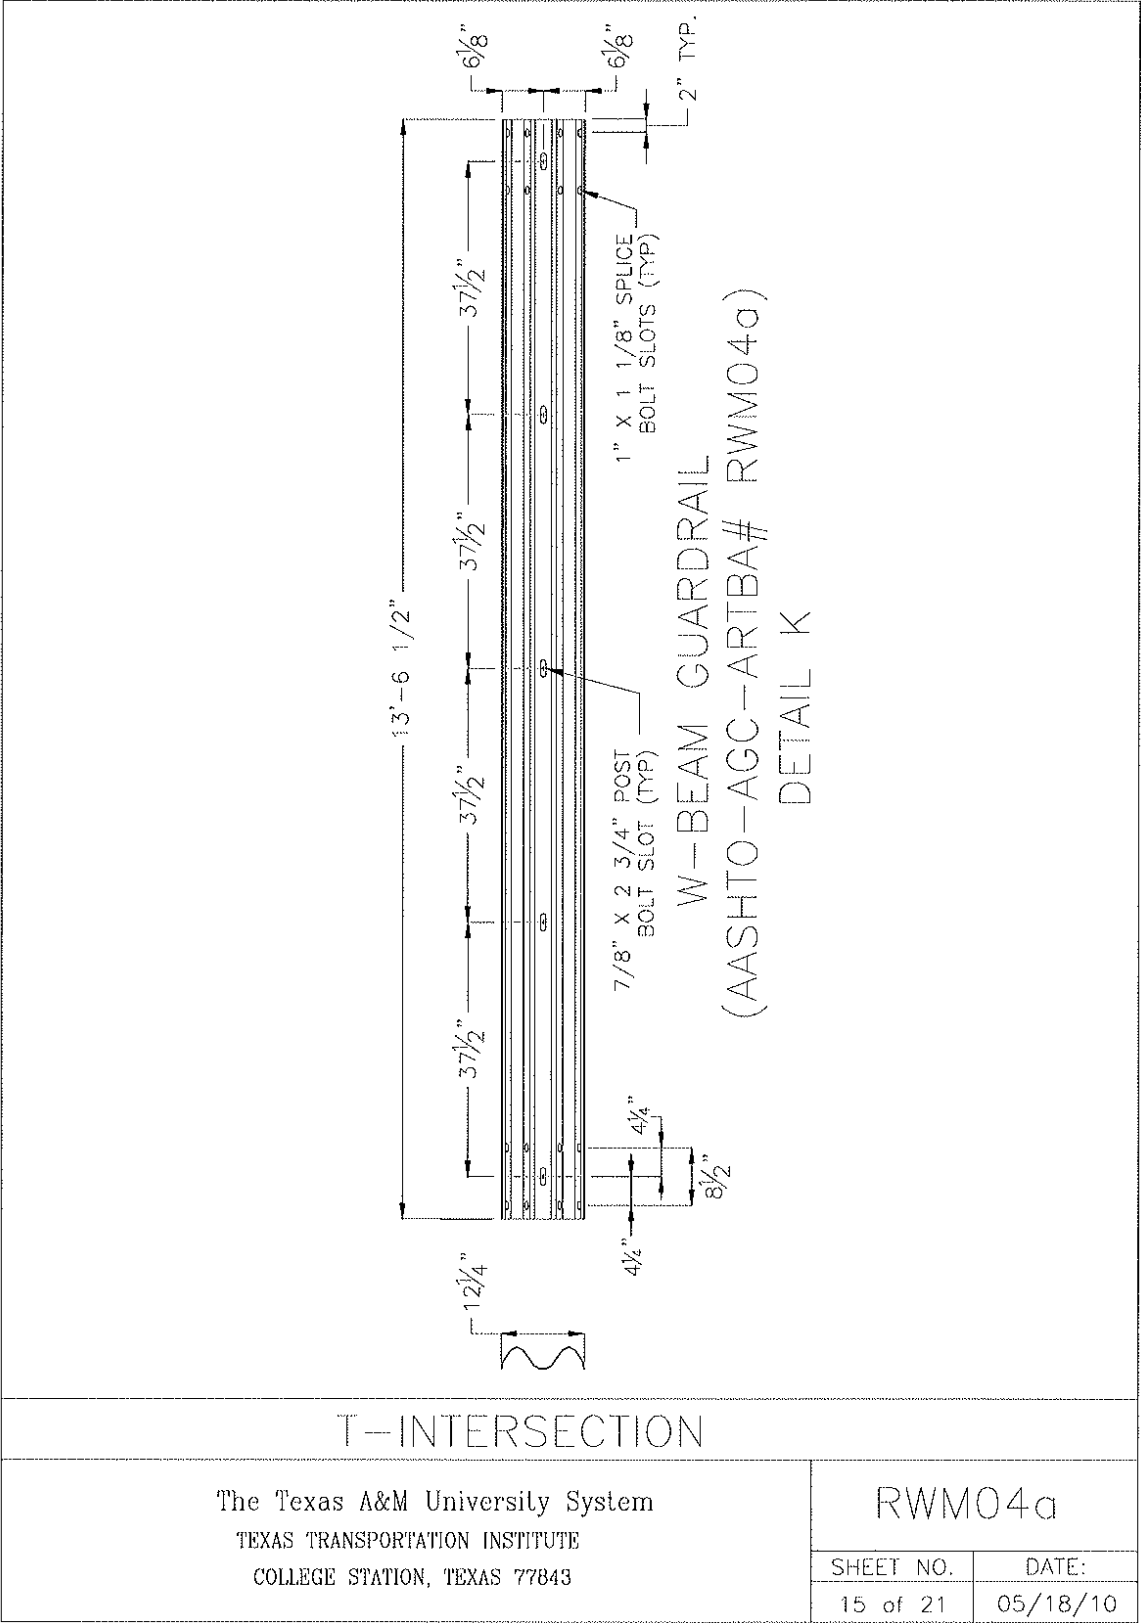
Rail Punch Details for Straight Guardrail Upstream of Radius [27]
